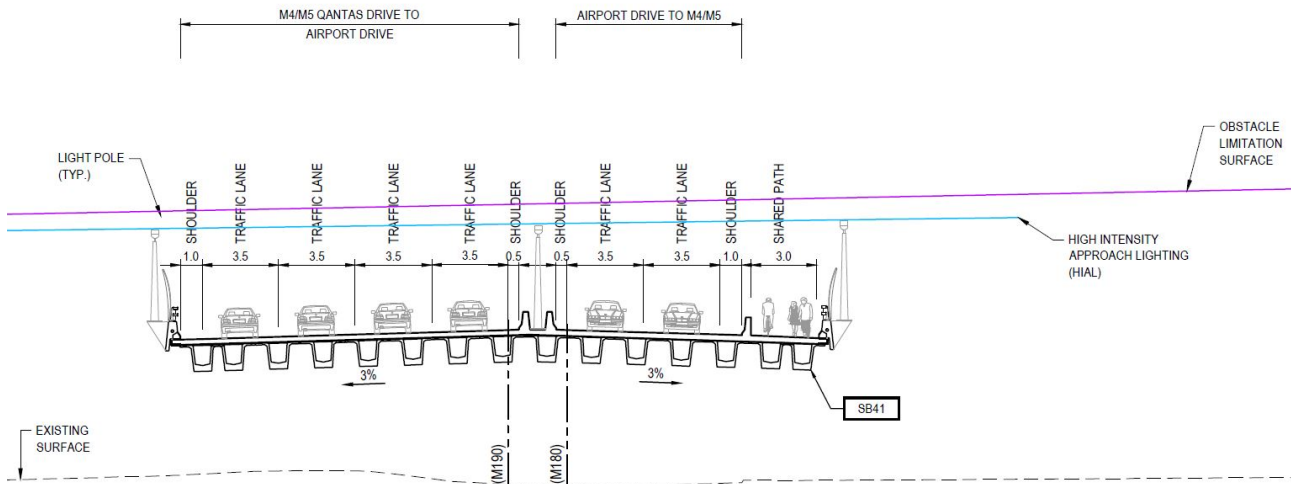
Typical elevated roadway section showing clearance to HIAL and OLS
